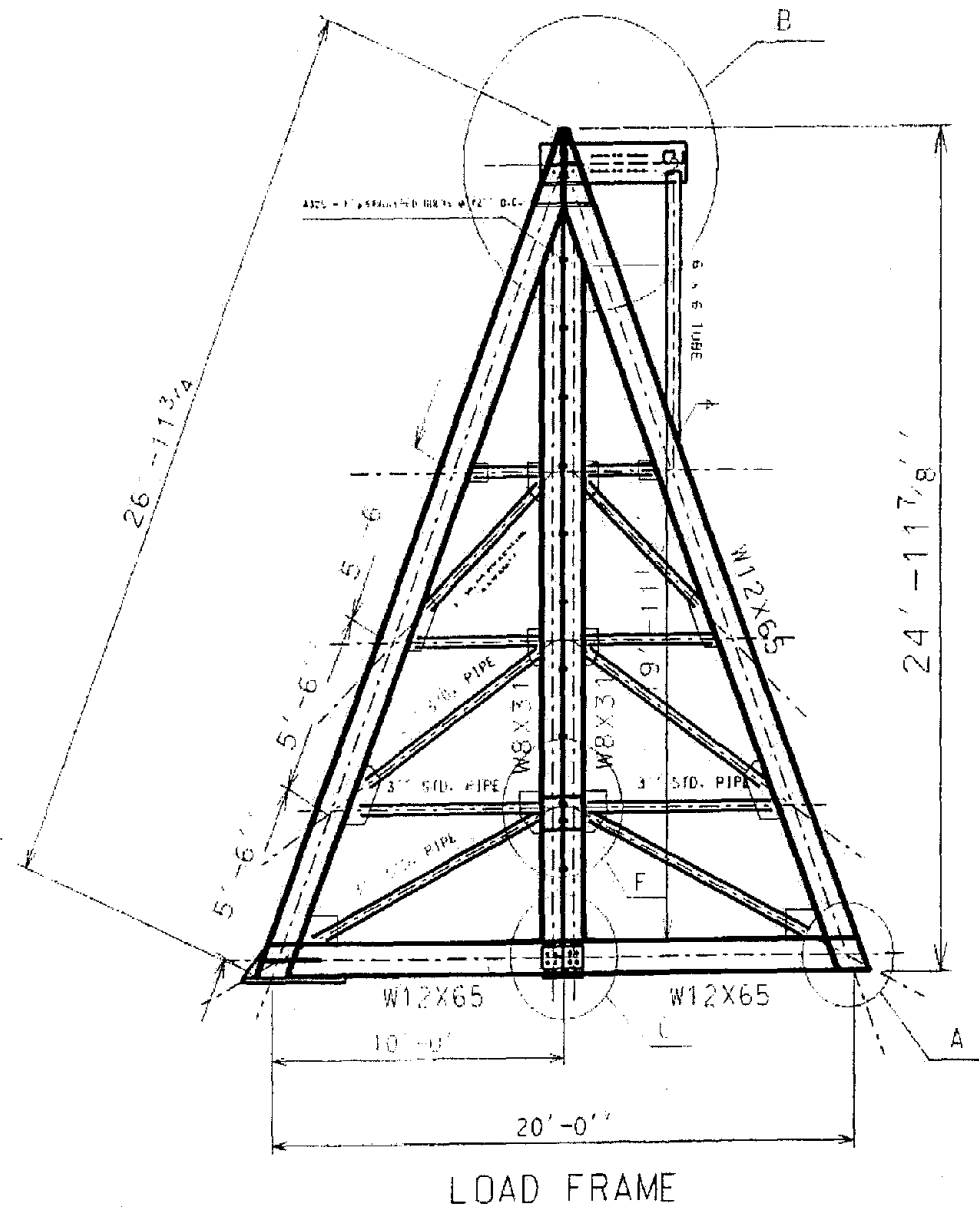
Construction drawing of load frame: Overall view (1'=305 mm, 1"=25.4 mm)
